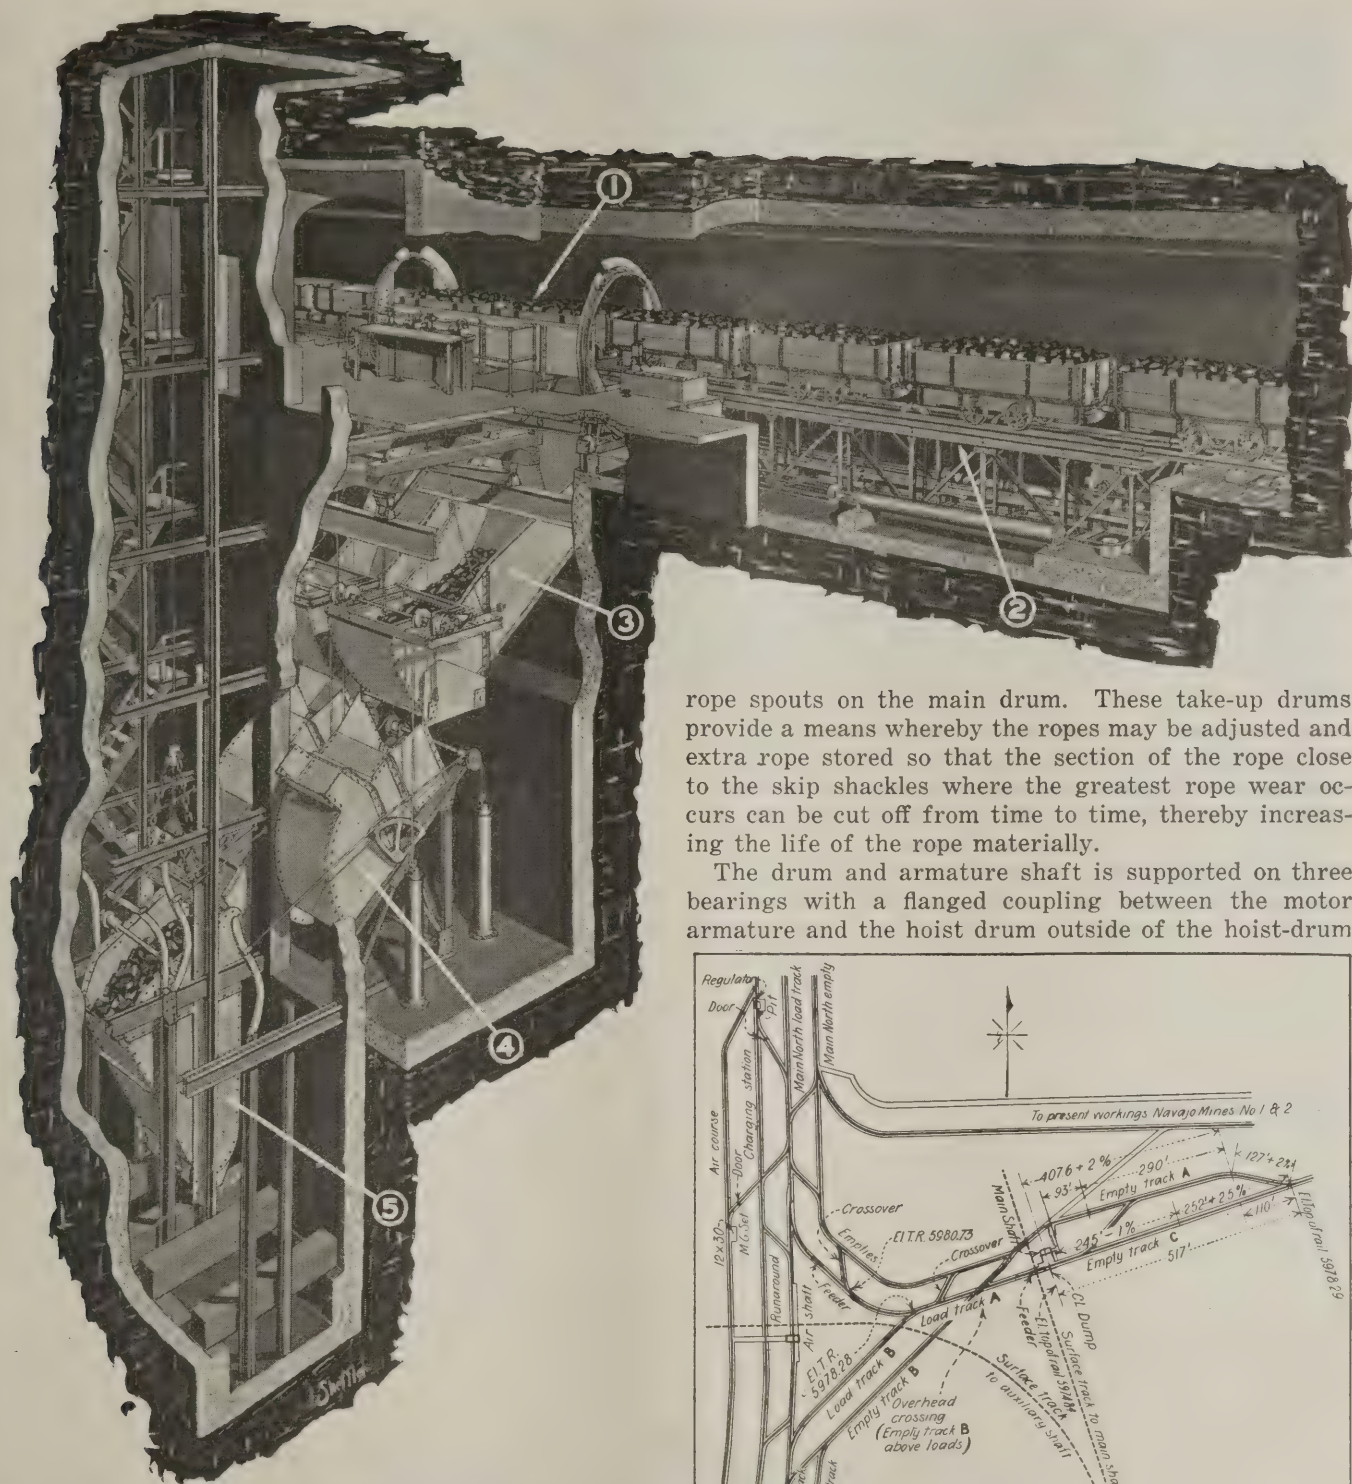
DETAILS OF EQUIPMENT IN BOTTOM OF SHAFT
